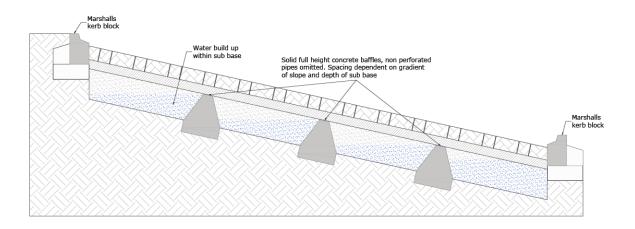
Permeable Paving Concrete Baffles [Marshalls- Permeable Paving Design Guide]
